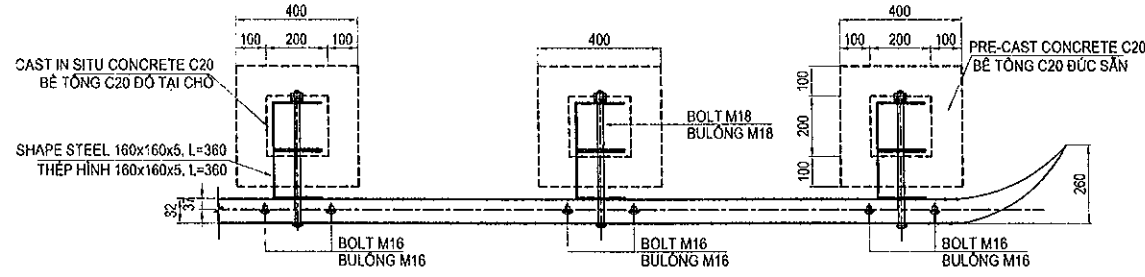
DETAIL OF REFLECTIVE CAP ARRANGEMENT
